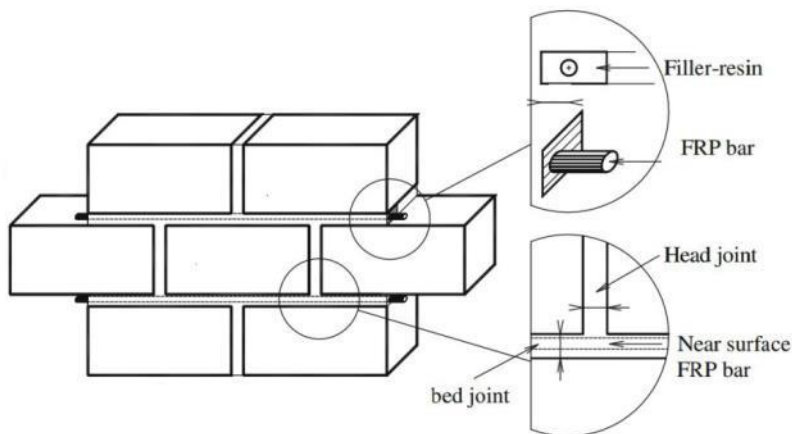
Bed joint NSM reinforcement for a masonry representative element [61]
